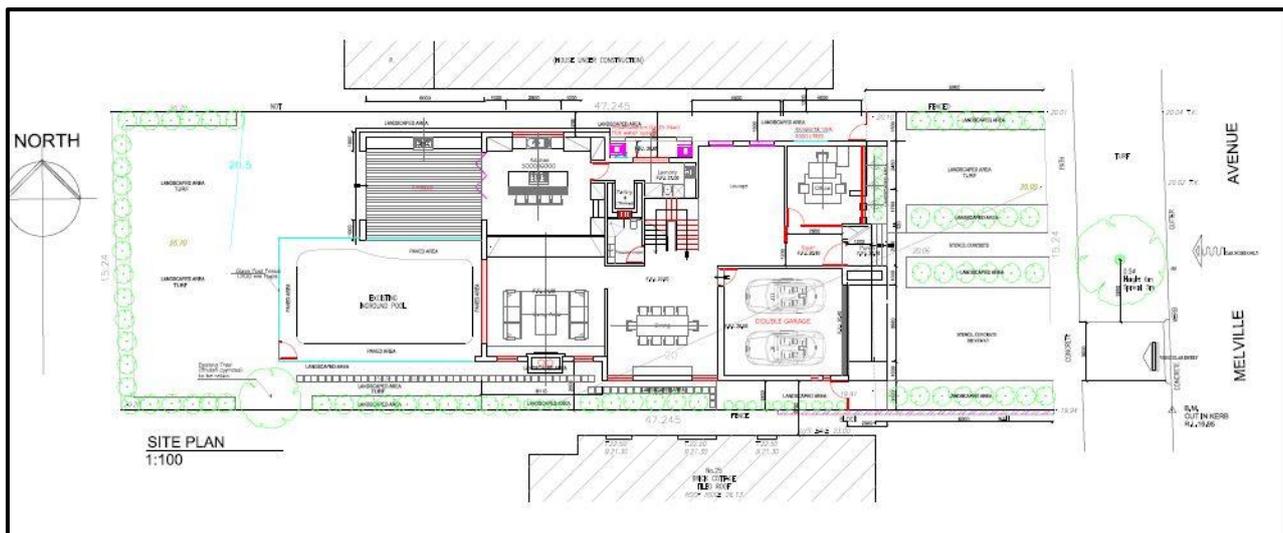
Site Plan and Ground Floor Plan of New Dwelling
